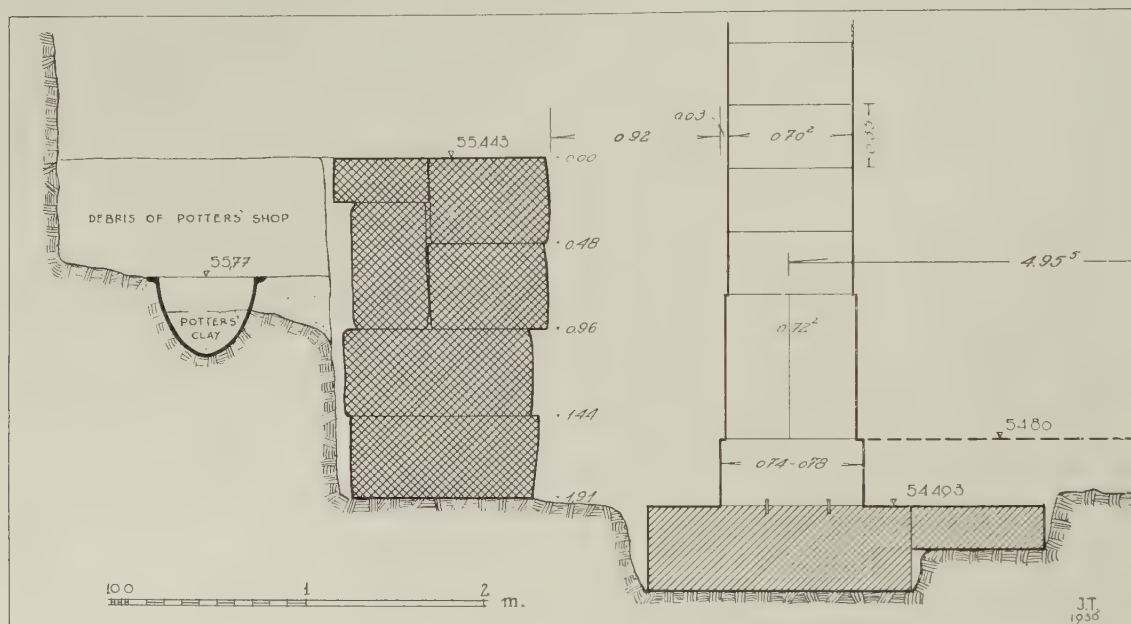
Section through Potter's Shop, Retaining Wall and Back Wall of Stoa
